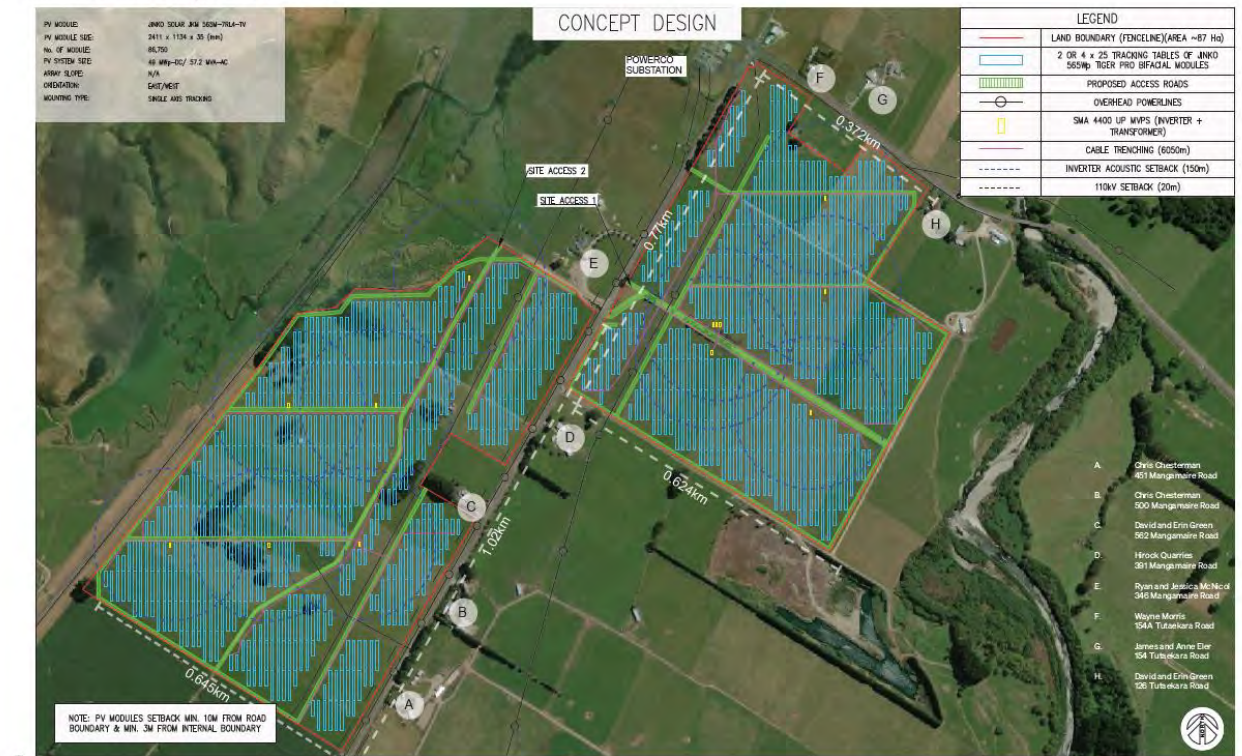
Proposed site layout showing solar panel locations (taken from Figure 3 of the application)
